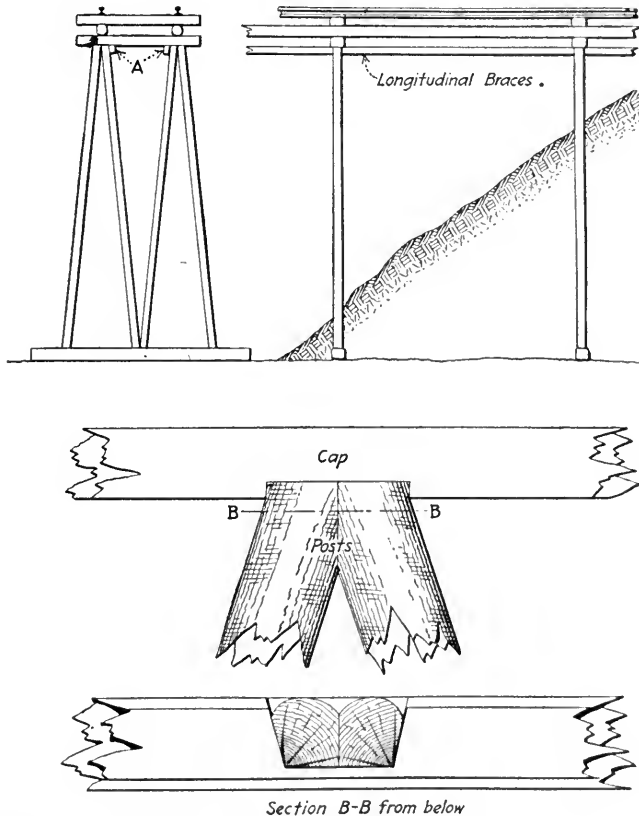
ELEVATIONS OF TRESTDLE END AND DETAIL OF NEW JOINT.
